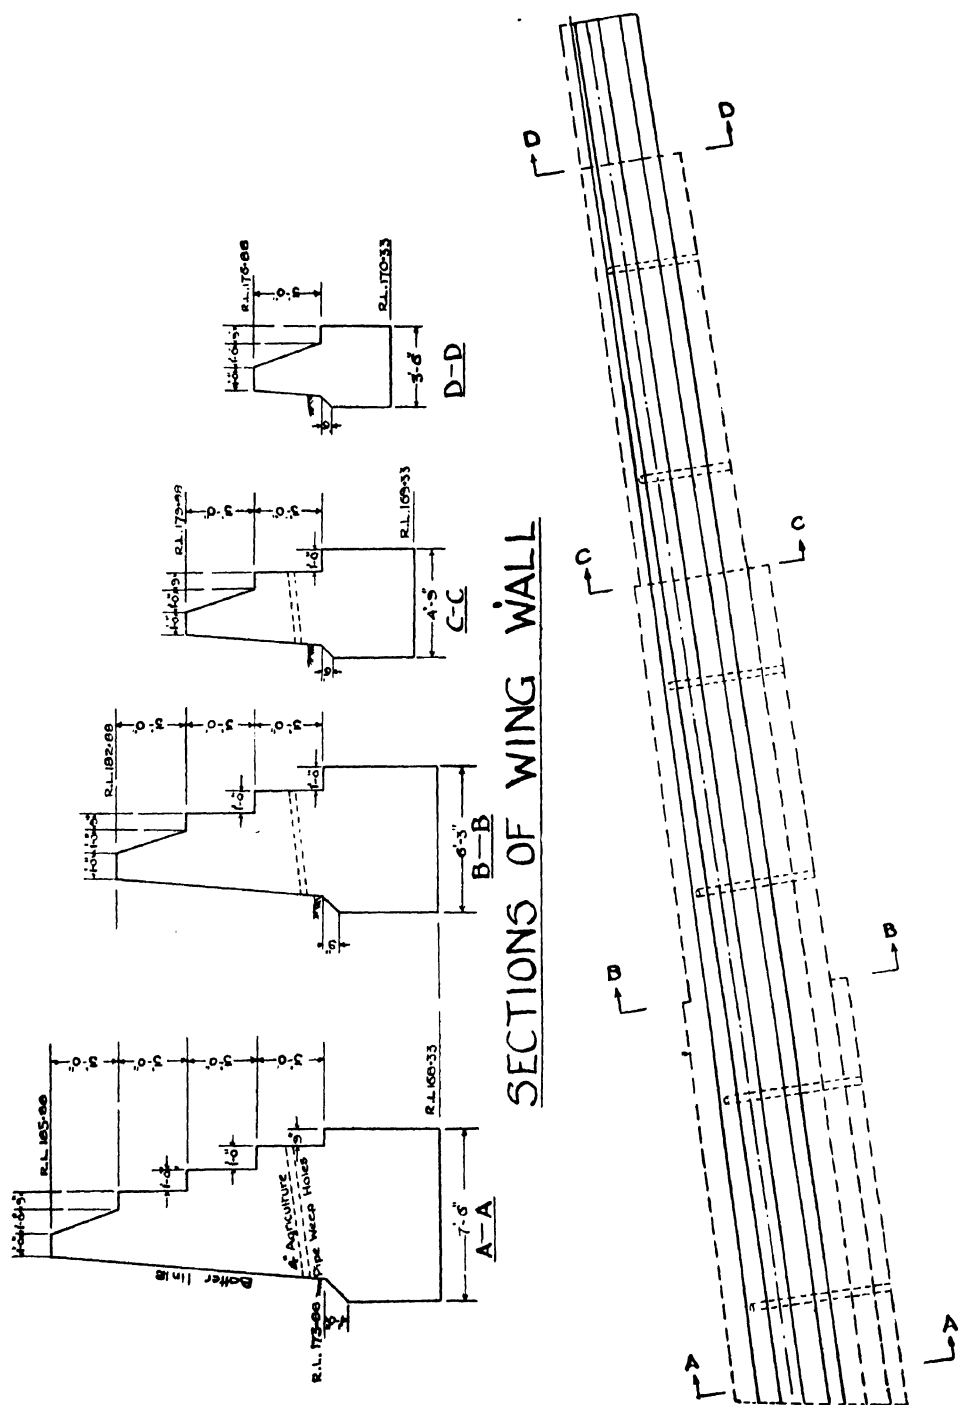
ABERGARW BRIDGE, GLAMORGAN: PLAN AND SECTIONS OF WING WALL. (See previous page.)
